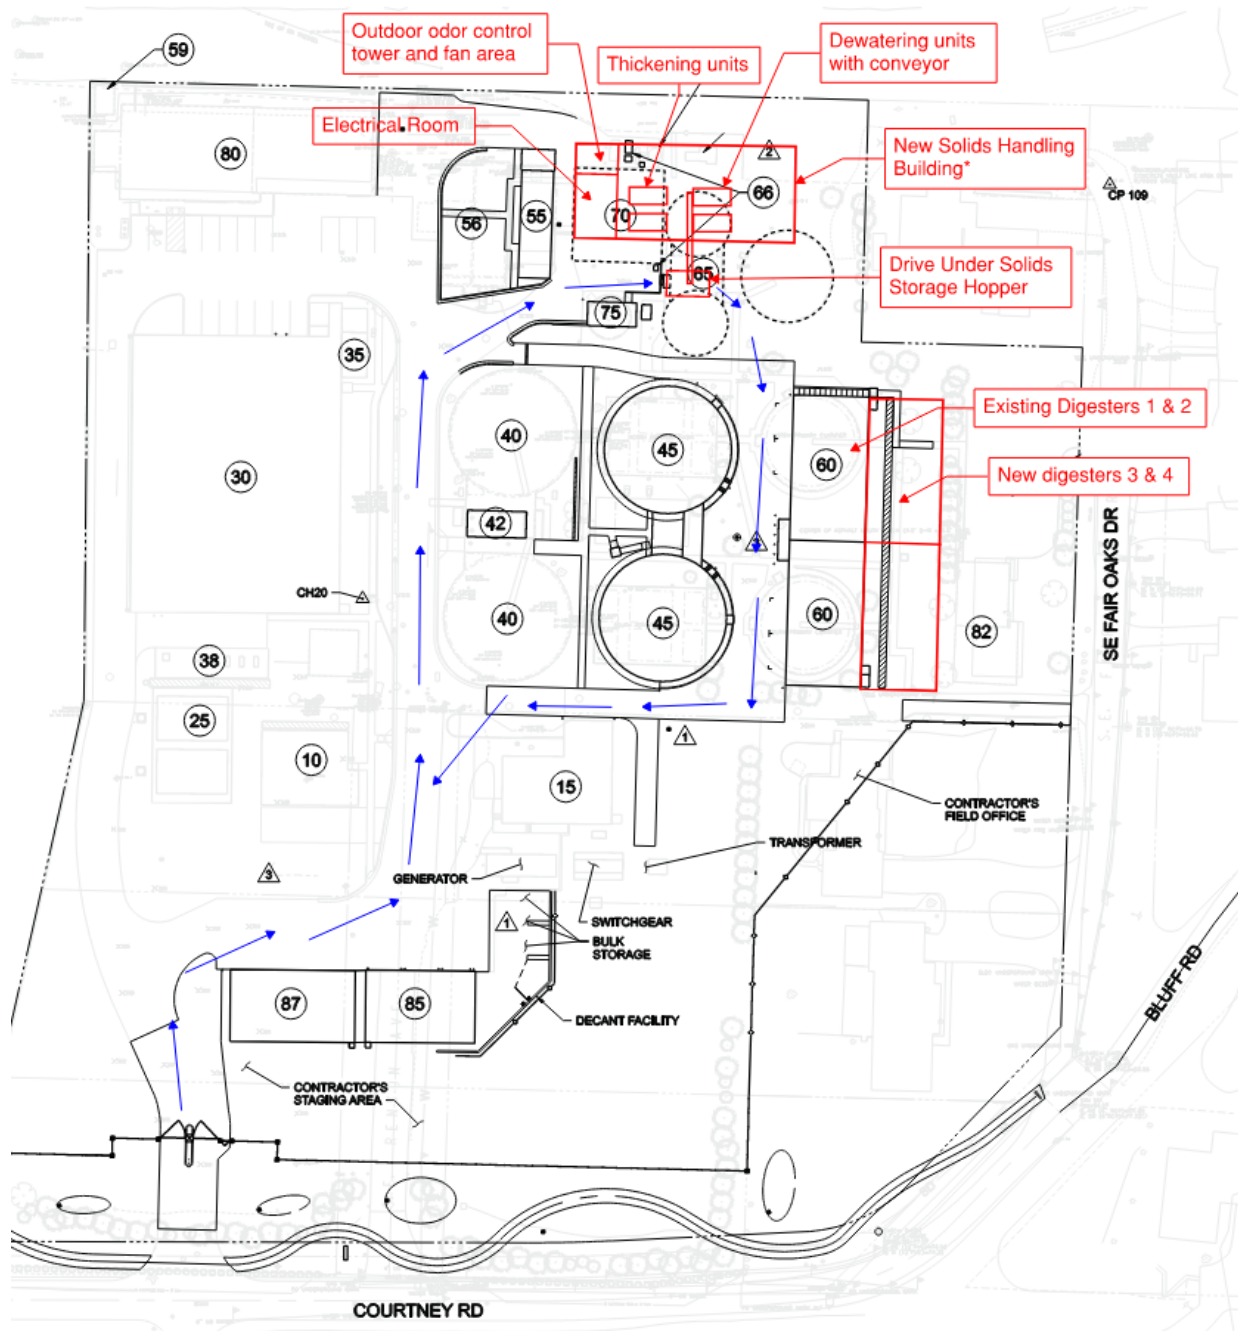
Alternative 1 - North Solids Handling Facility and Expansion of Rectangular Digesters
